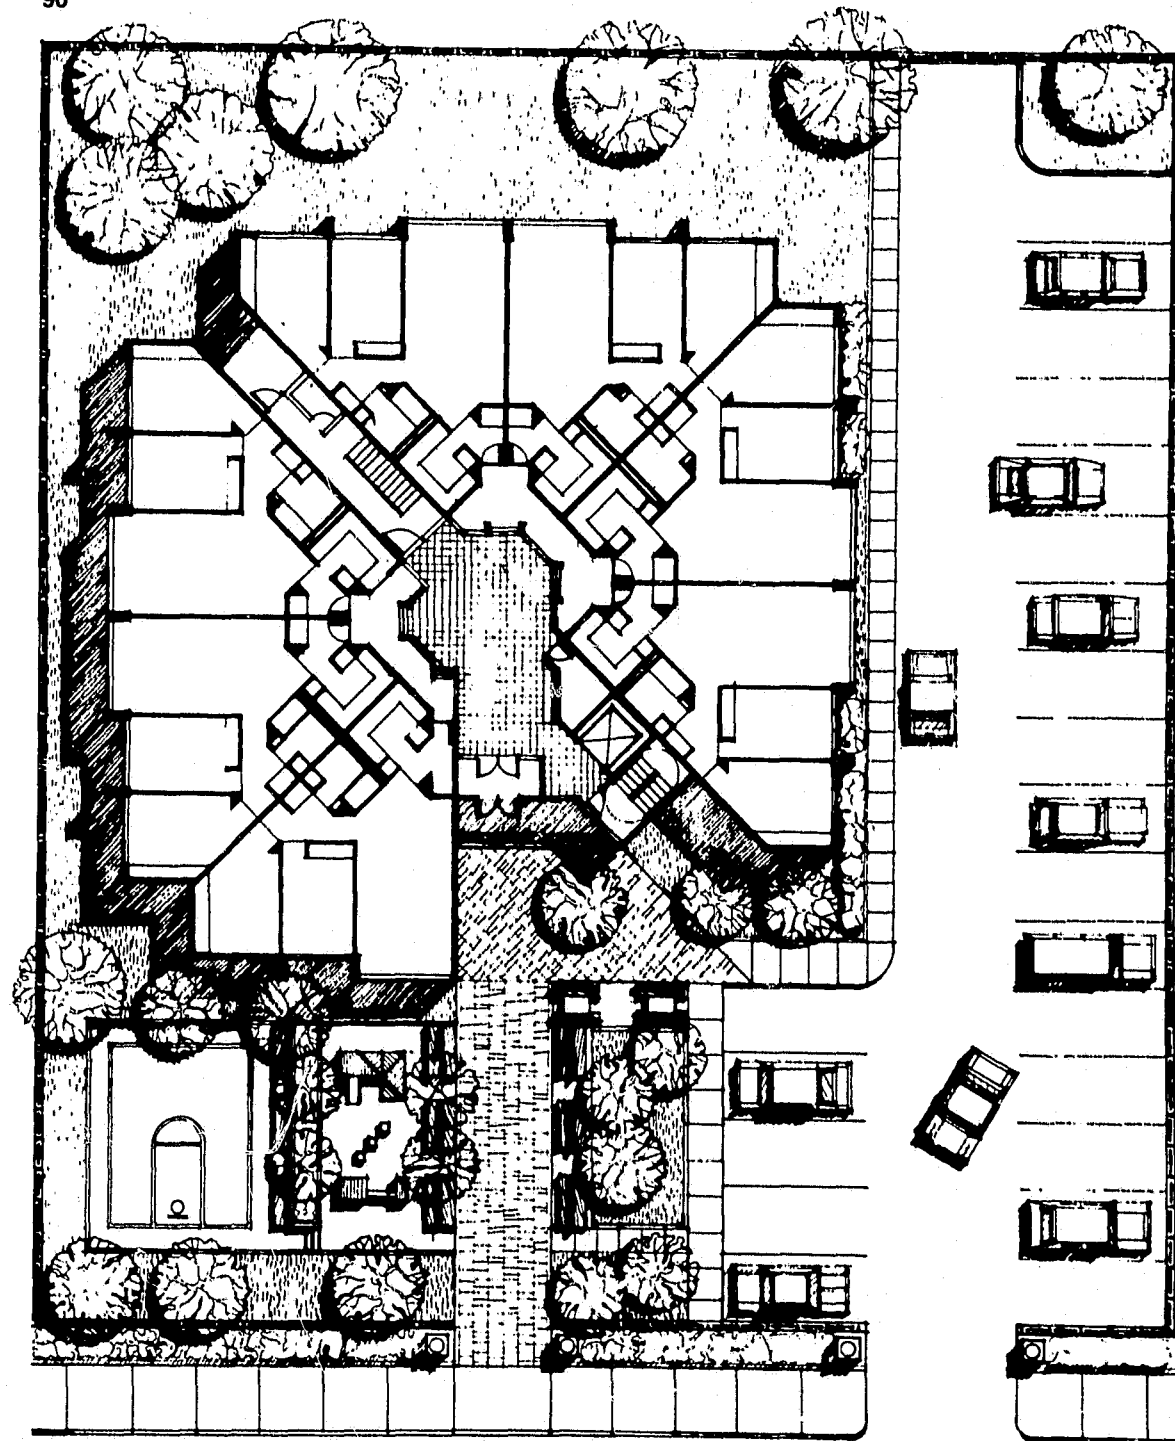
Ground floor and site plan of seven-story high-rise for families with children. The grounds have been fenced except for two entries.
